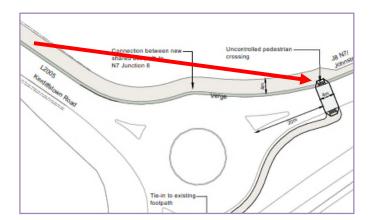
EW5604-00-030 Rev O, New Site Access Proposed Pedestrian Access and Cycleway & Site Observation.
